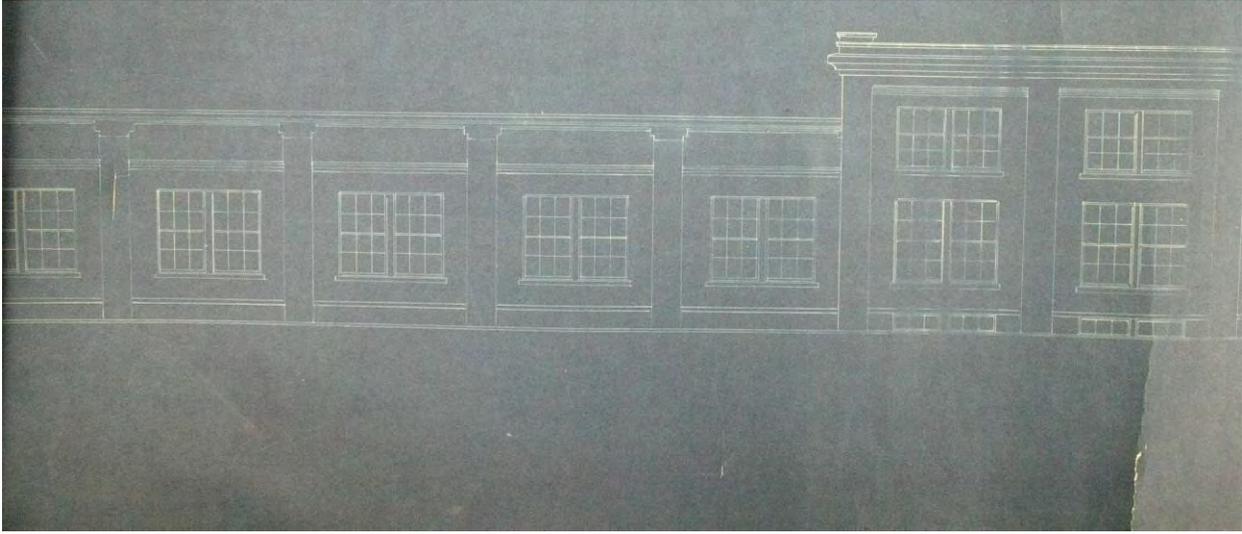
Partial elevation, Washington Avenue, source: Northwest Architectural Archives
